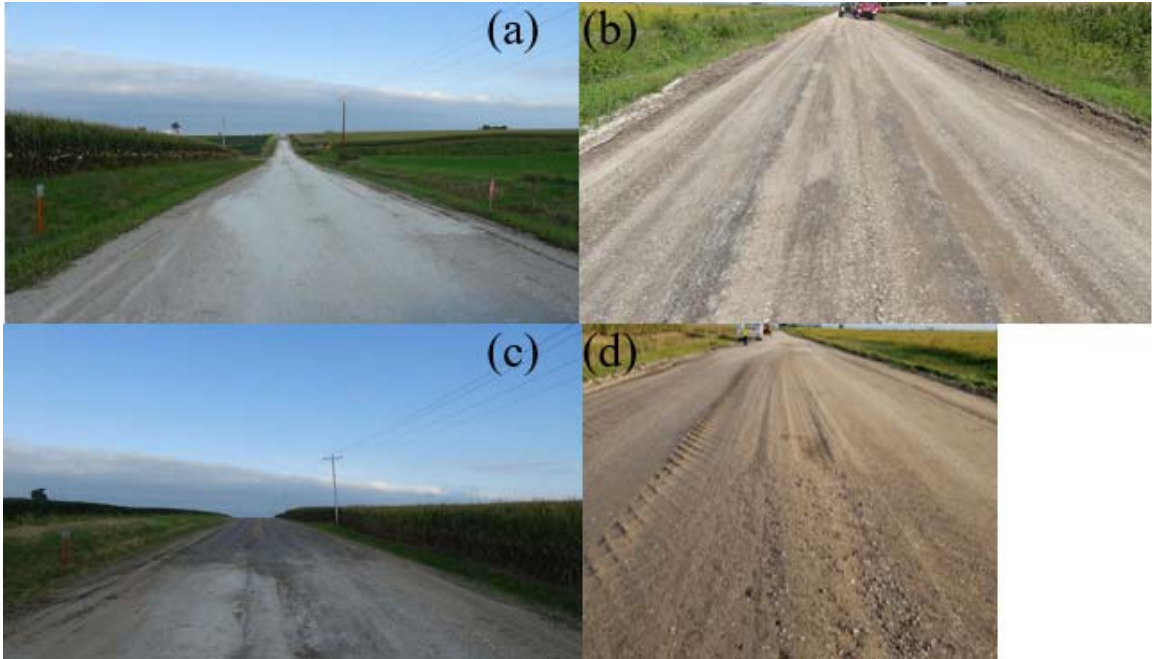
Base One sections at end of construction (a) Washington (b) Hamilton, and Claycrete sections at end of construction (c) Washington (d) Hamilton
